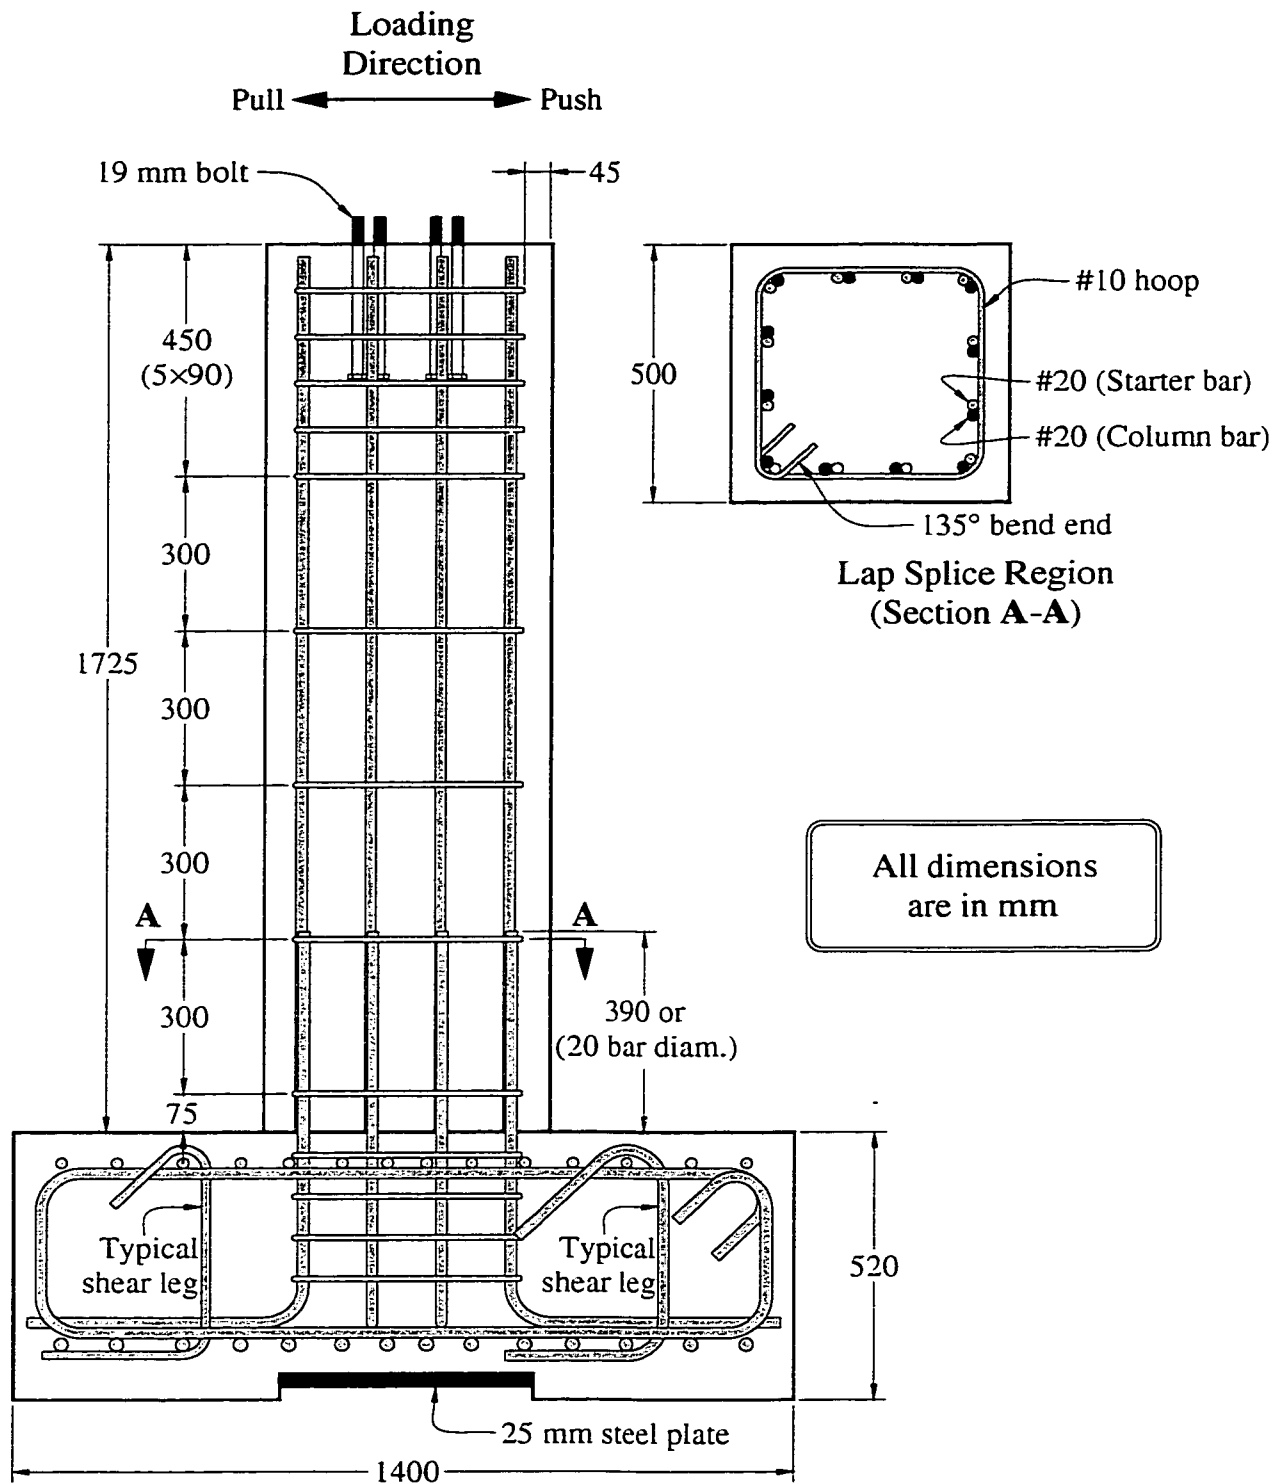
Dimensions and reinforcement details for columns BR-S5 and BR-S6
